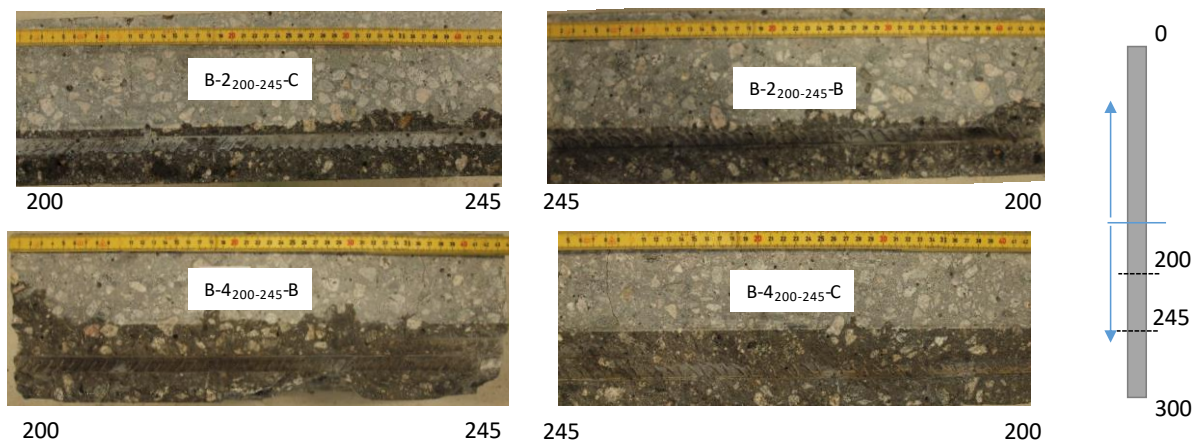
Steel-concrete interface of beam B section 200 to 245 cm. White precipitate at the cracks and spread over the steel-concrete interface
